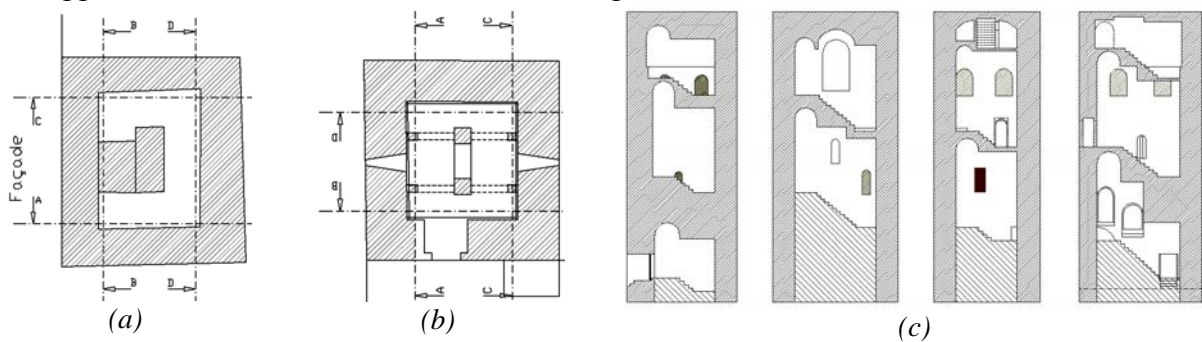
Partial sections of the towers: (a) horizontal section of the South tower, (b) horizontal section of the North tower and (c) sections A-D for the South tower.
